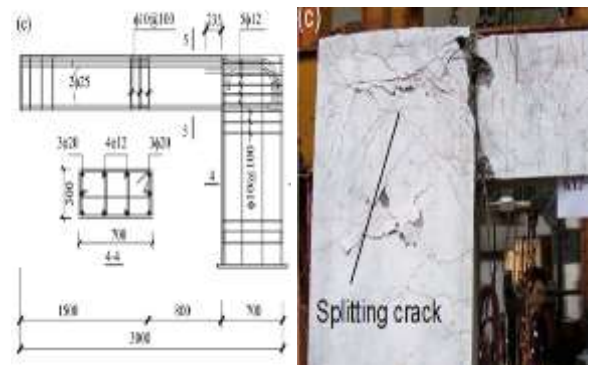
RC Knee Joint Specimen (Wang et al. 2016)
